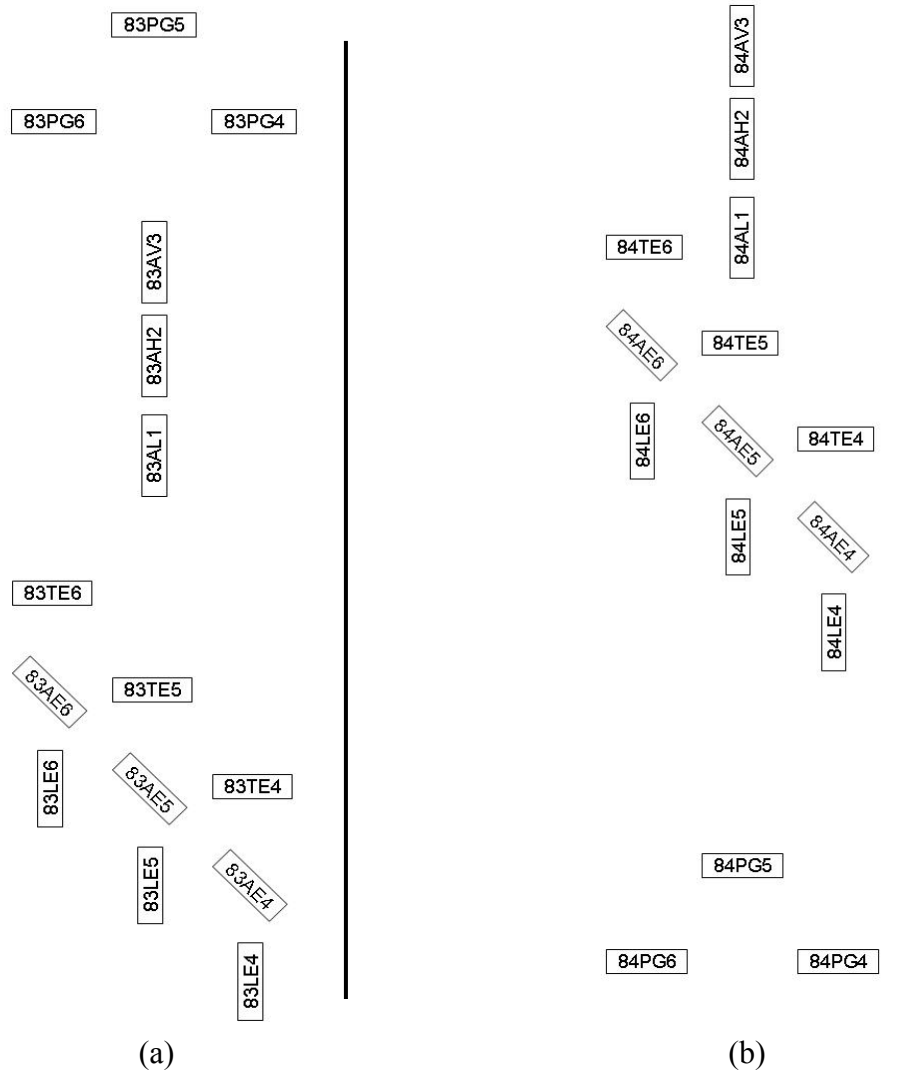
Flexible pavement sections sensor designations for westbound lanes of
